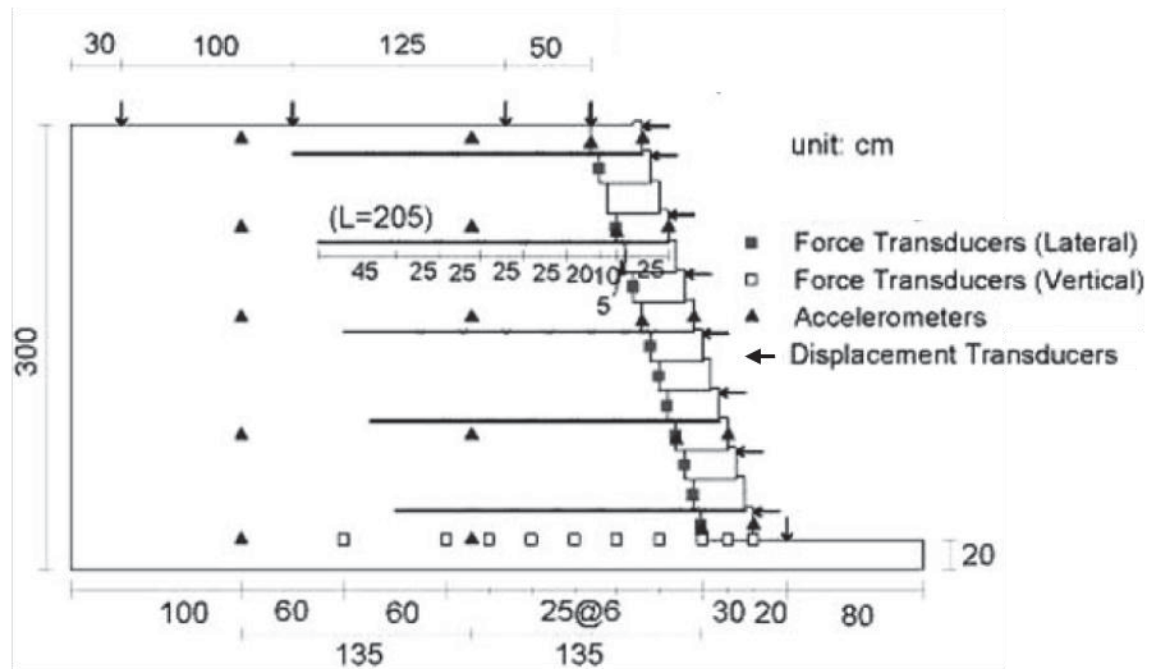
Full scale shake table test of segmented retaining wall (Ling et al. 2005)
